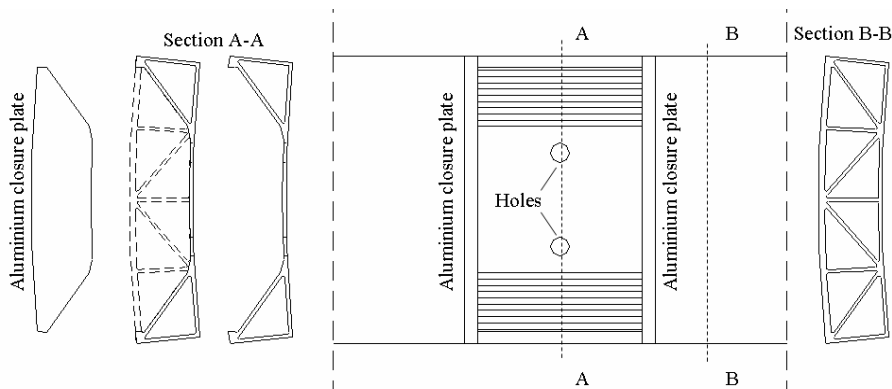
Detail of the aluminium layer next to the anchoring device.
